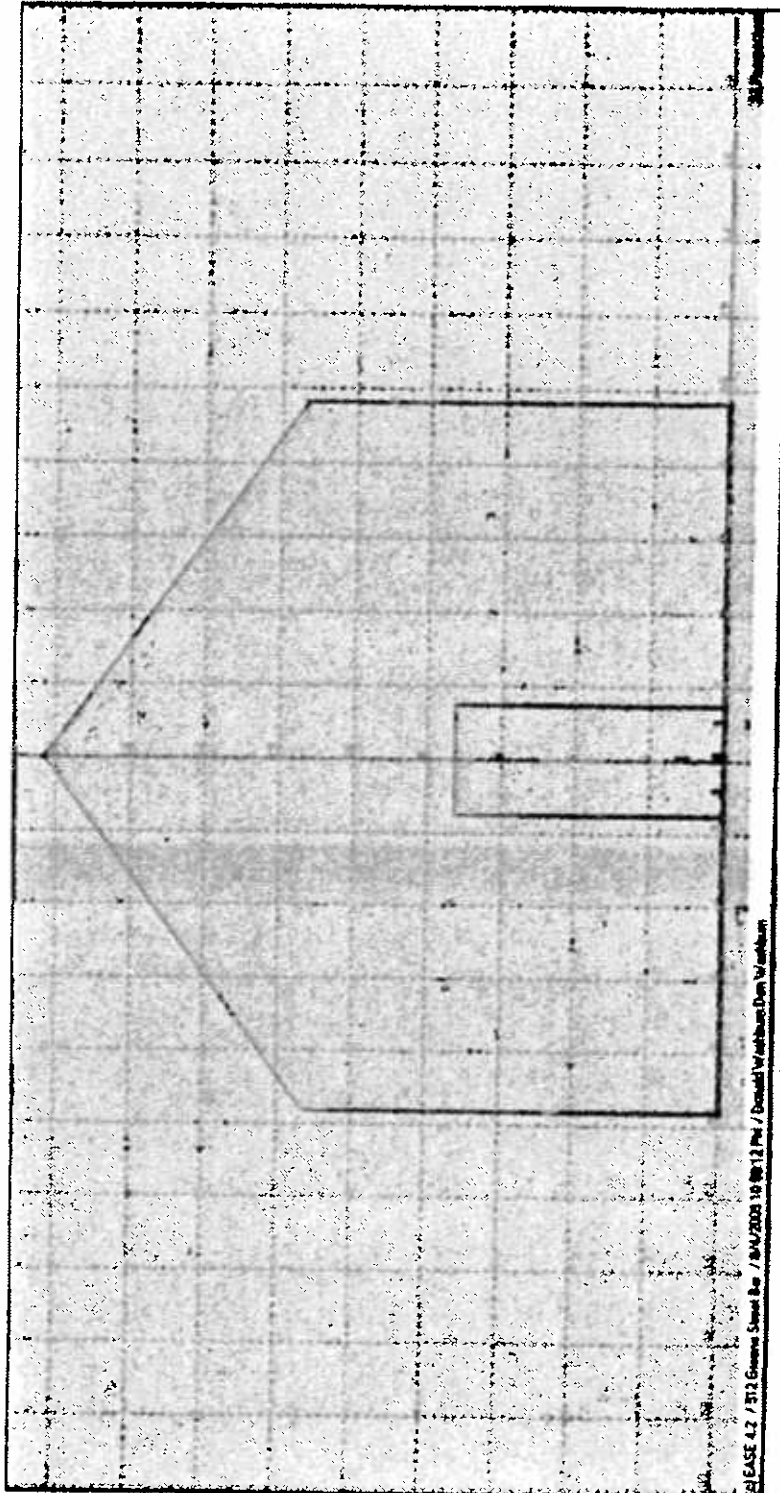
End section view of Greene Street Bar as rendered in EASE 4.2
